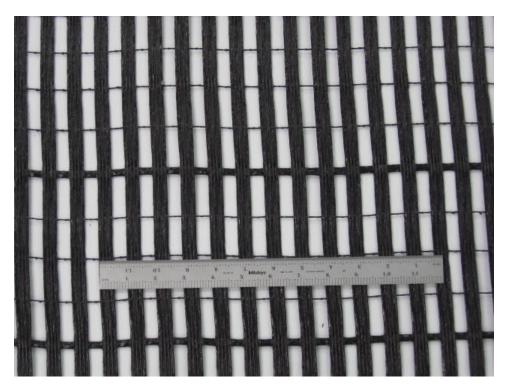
Photo of Miragrid 24XT (machine direction is perpendicular to ruler shown).
